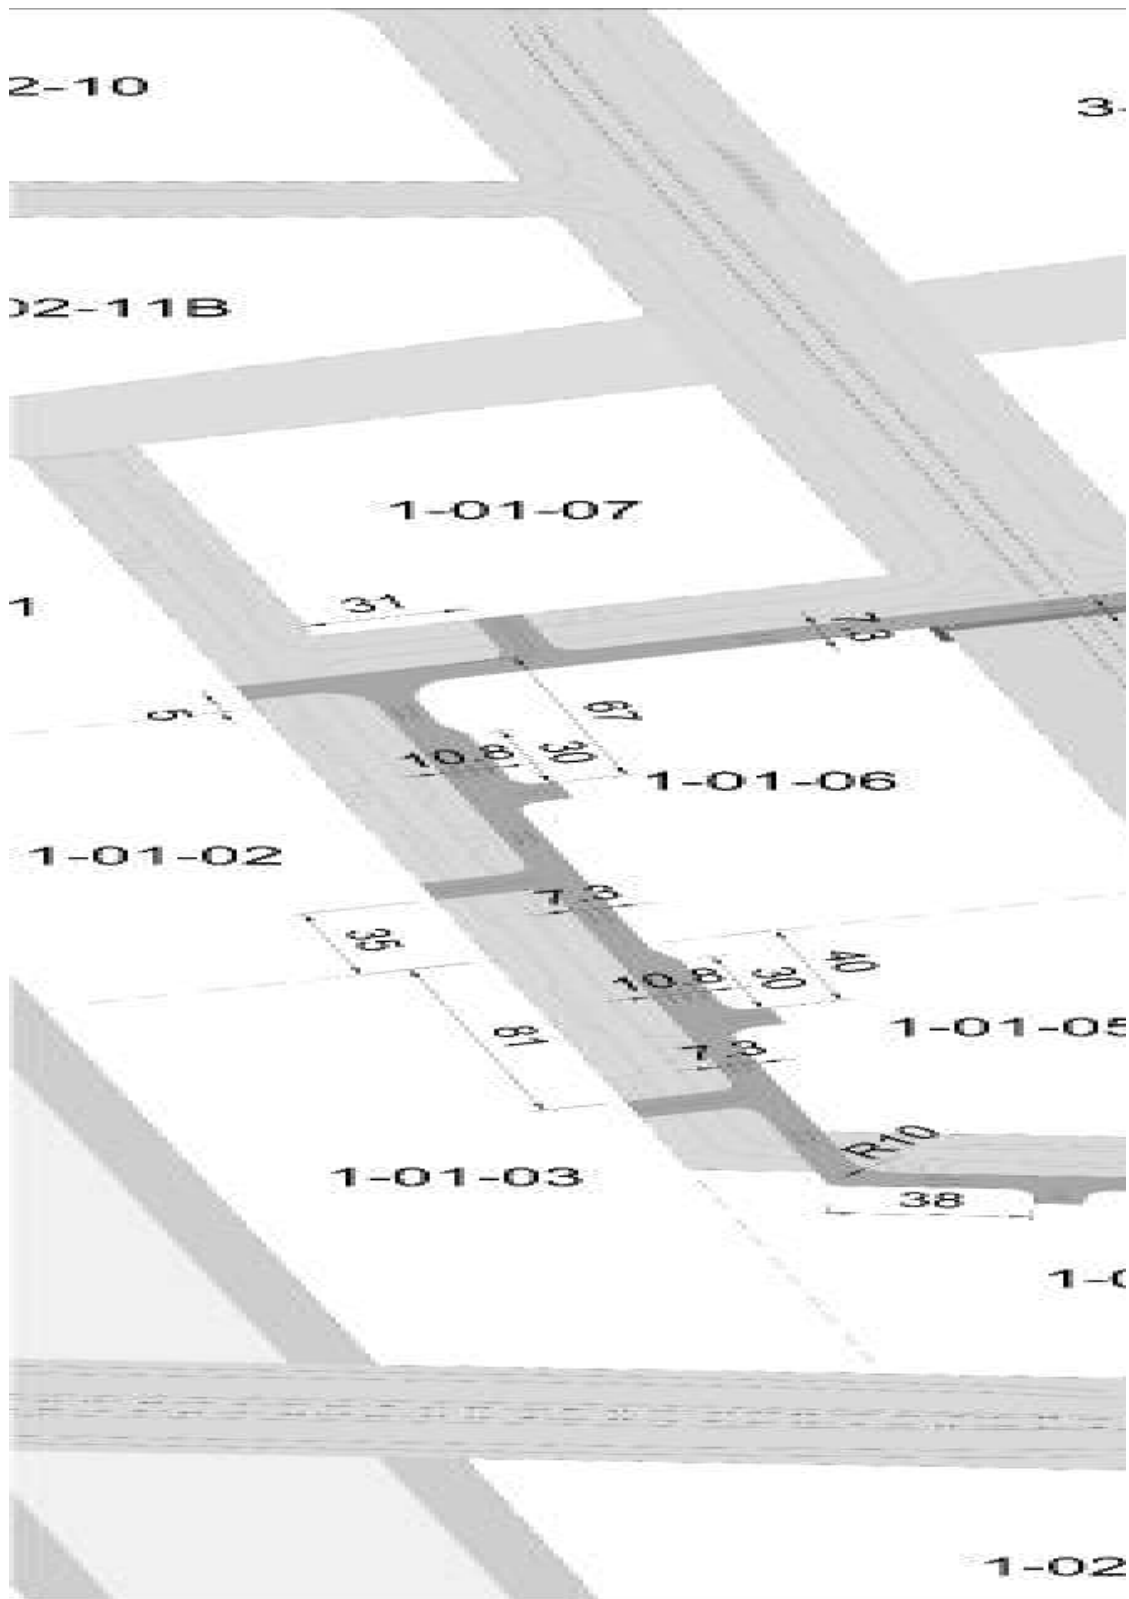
9 Vehicular Ingress Basement Car Park Circulation Plan
